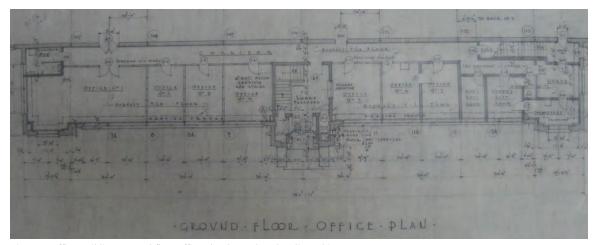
Office Building, ground floor office plan by Beck and Eadie Architects, 1946. (Source: GE Lighting)
